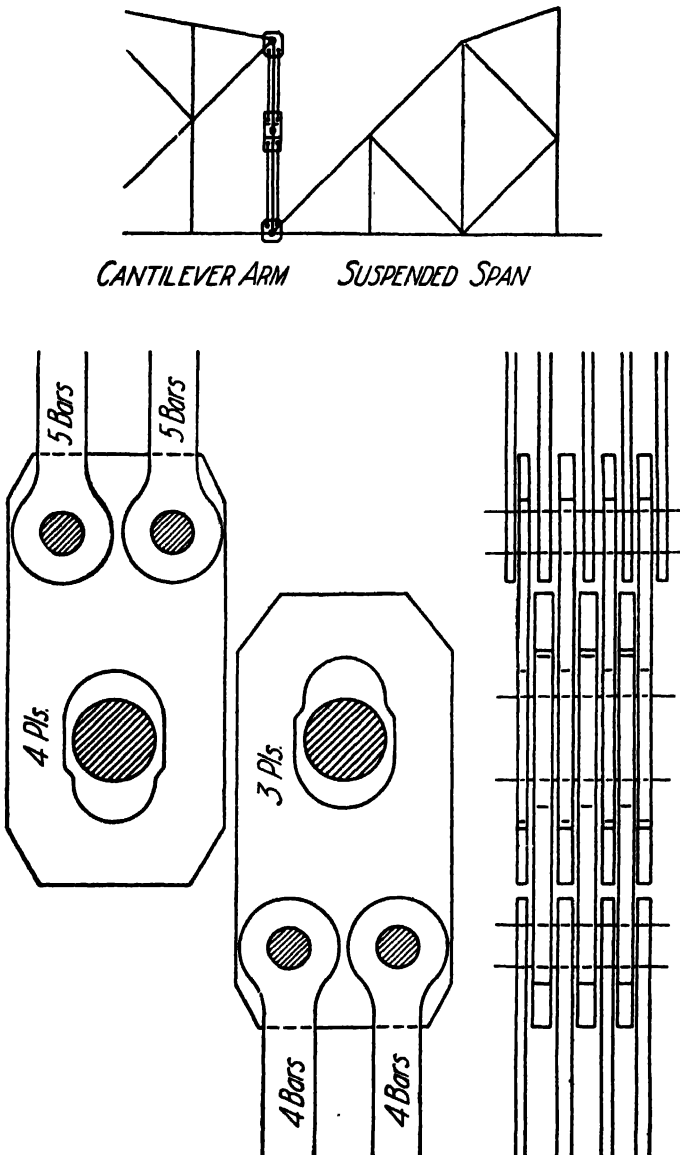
g. Detail of Connection between Suspended Span and Cantilever Arm for Quick Erection.
